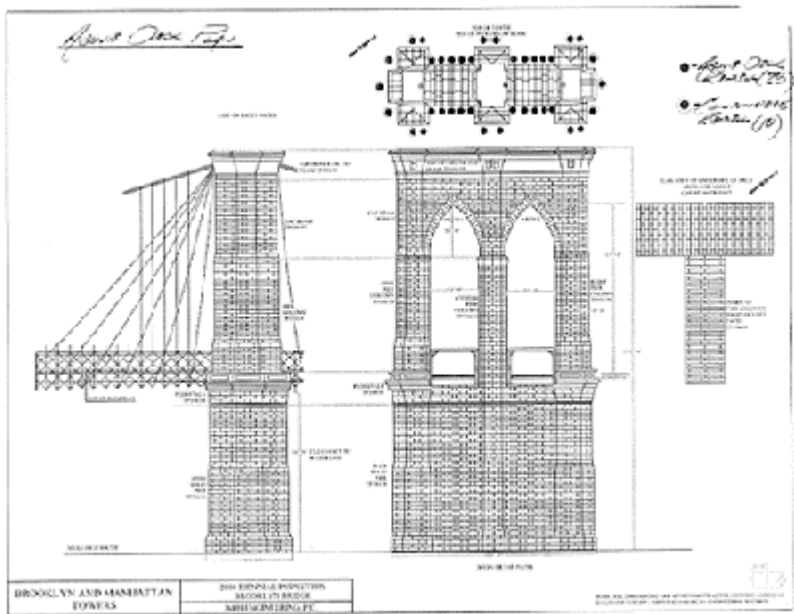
General Brooklyn Bridge Tower configuration and inspection plan.
